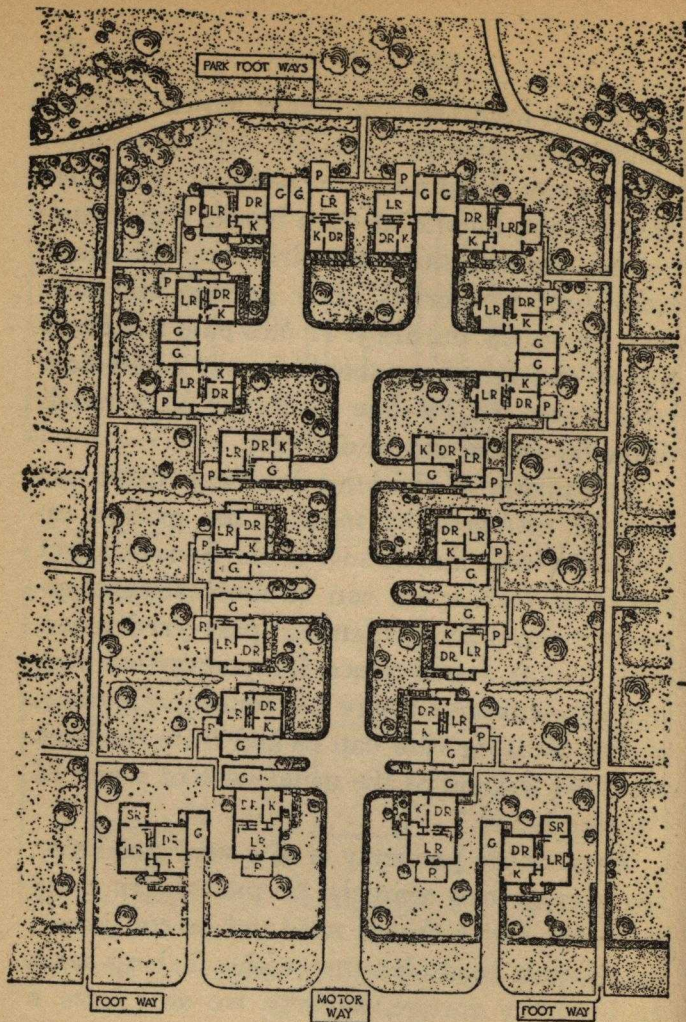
Section of City Plan of Radburn, New Jersey—a town designed for the motor age—showing layout of motor and foot approaches to houses. (*City Housing Corporation.*)
